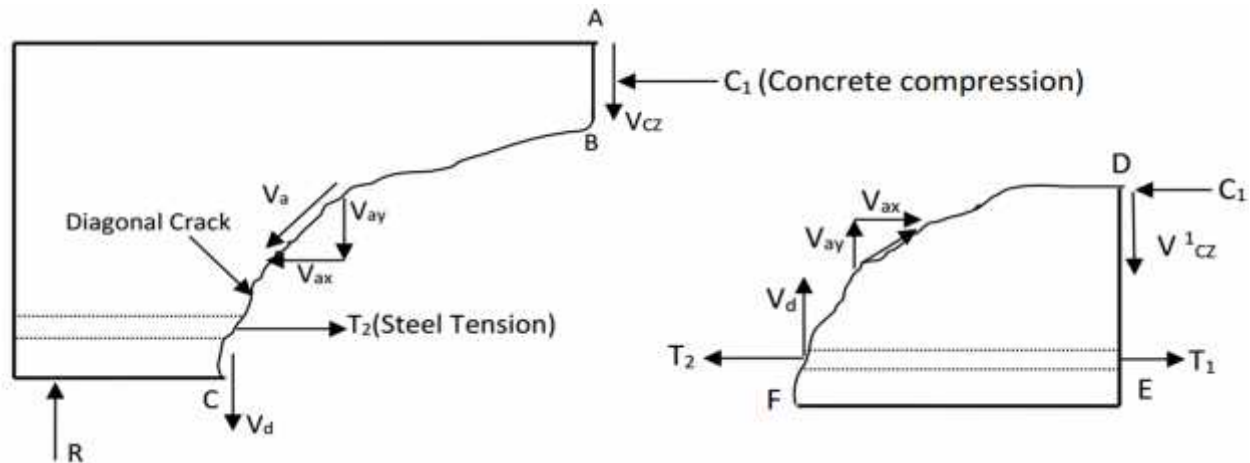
Internal forces in a cracked beam without stirrups (Ahmed *et al.*(1986))
